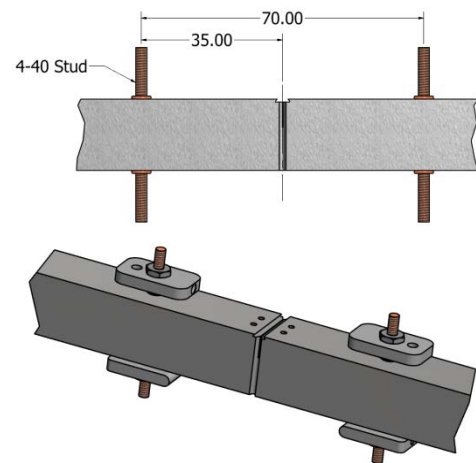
Details of the threaded post locations for the extensometer mounts; (top) side view with dimensions and (bottom) isometric view of the posts with blocks installed.
